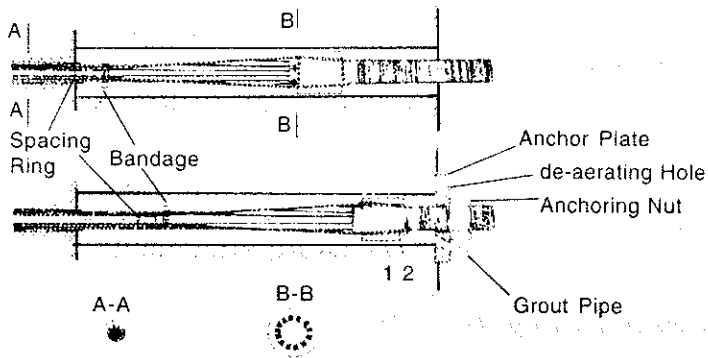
2 : Prestressing an anchor provided with screw-on nut
